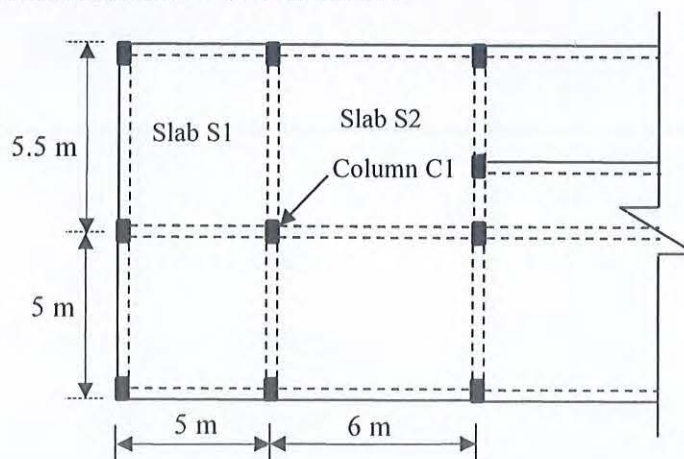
Floor Layout Plan of 9-Storeyed Nurse Institute
